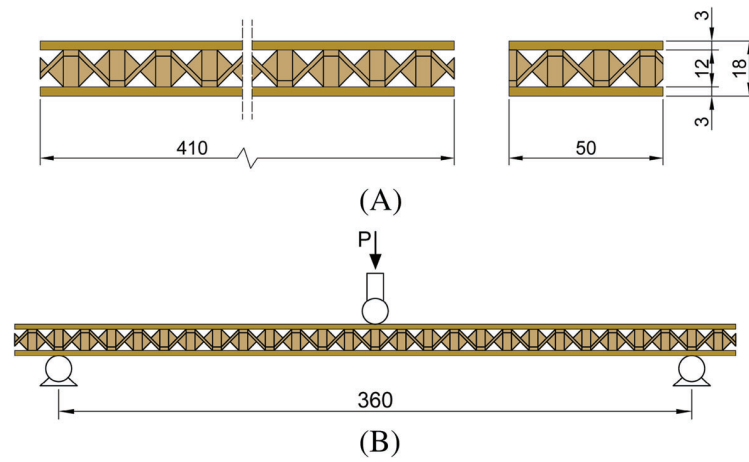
Sandwich panel specimen dimensions (A) and setup of the bending test (B)
